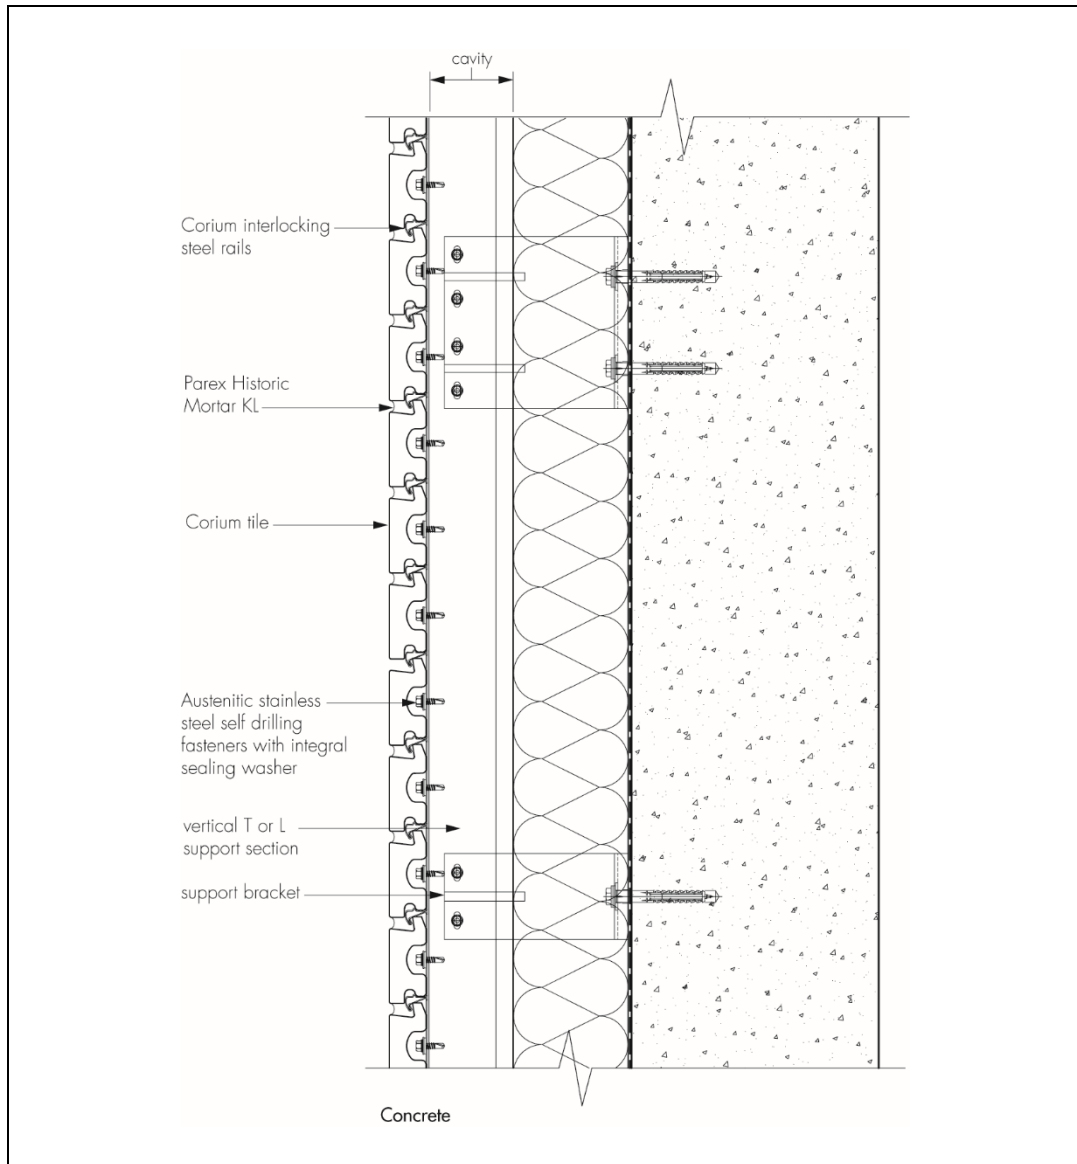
Installation detail of the Corium Brick Tile Cladding System (continued)
